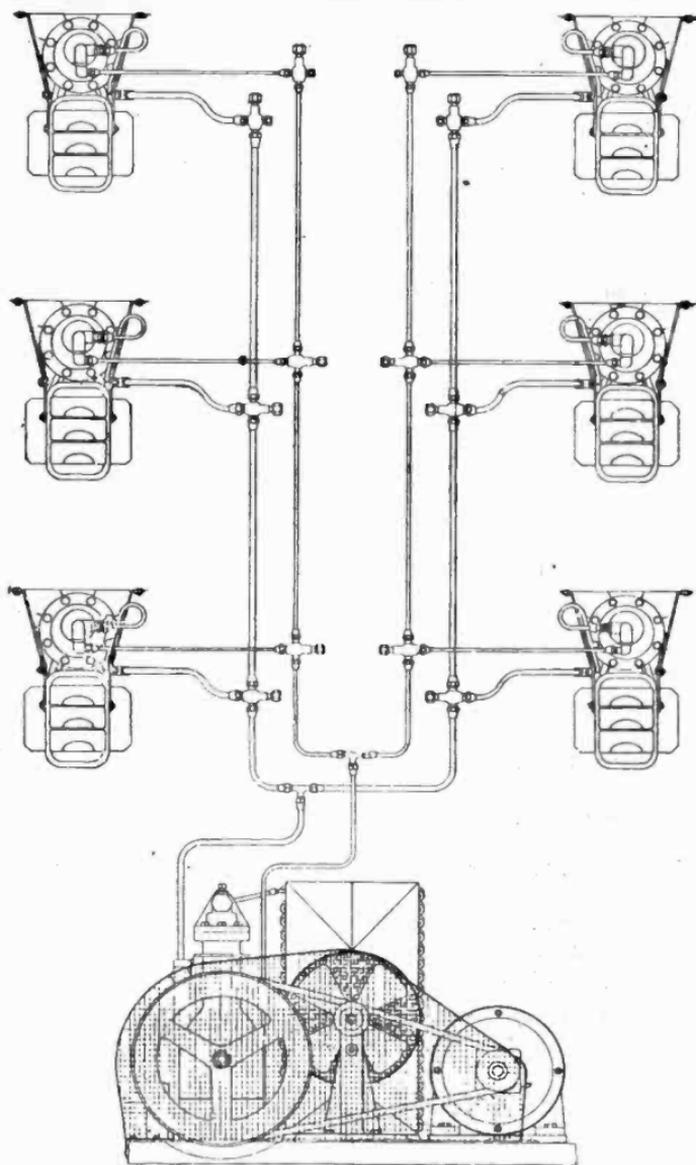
Servel apartment house installation with *header and riser* piping system.
